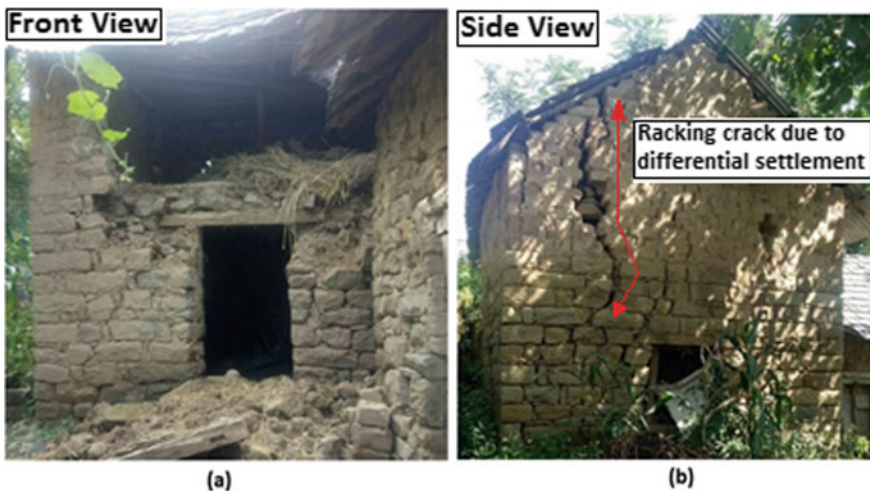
a Out-of-plane failure of the wall. b Development of cracks from openings
